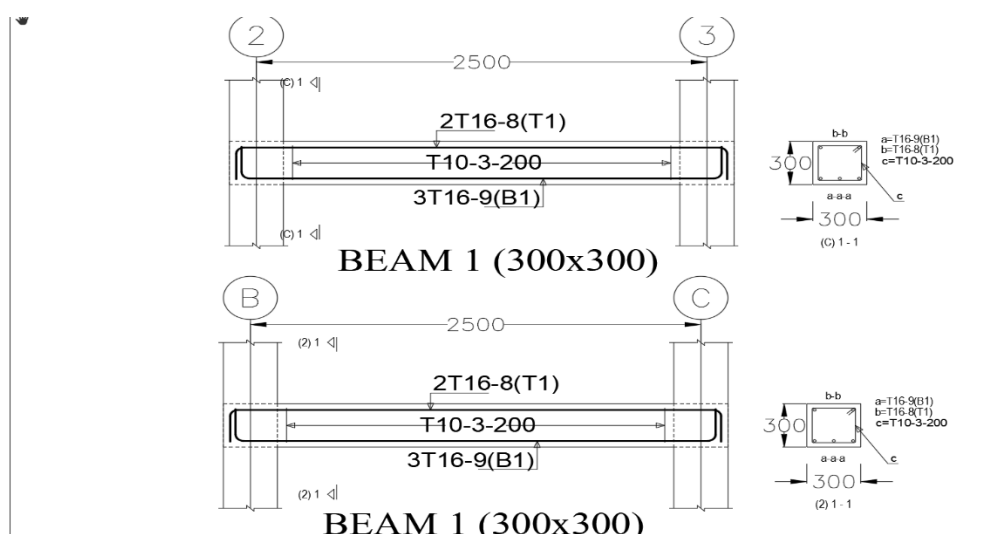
Detailed Reinforcement Layout for Foundation Beams
